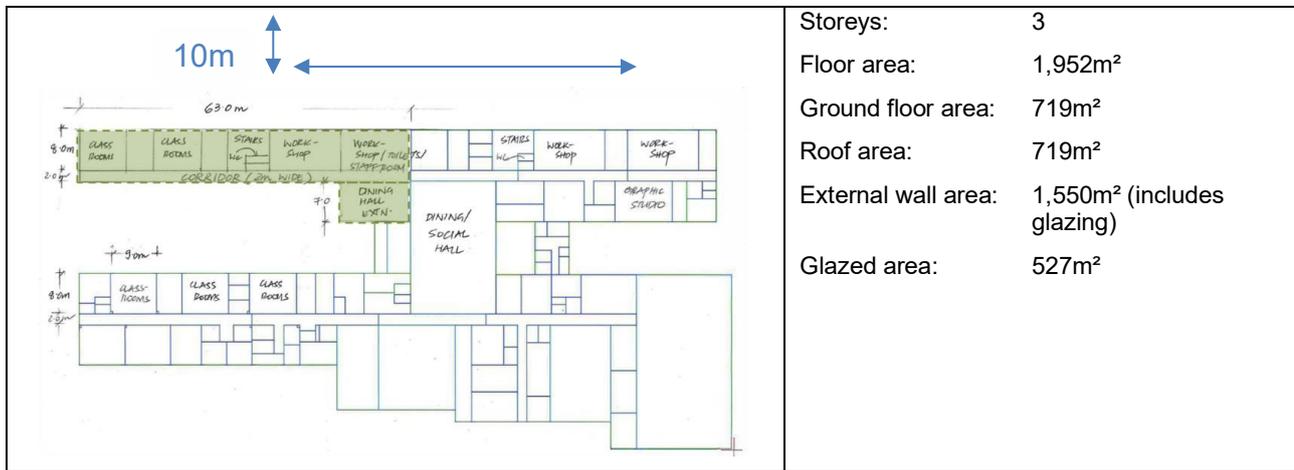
Sketch of the school building form used for the existing building modelling with an extension
